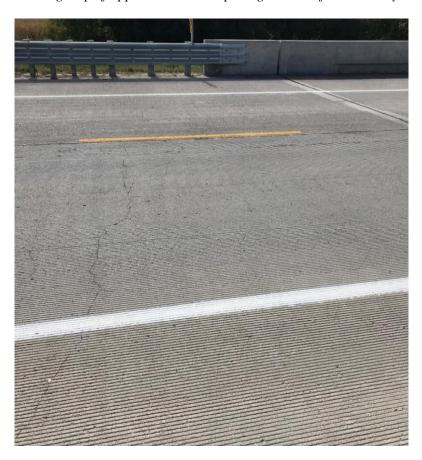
Cracking map of approach slab and paving section of Little Sandy Creek bridge.
